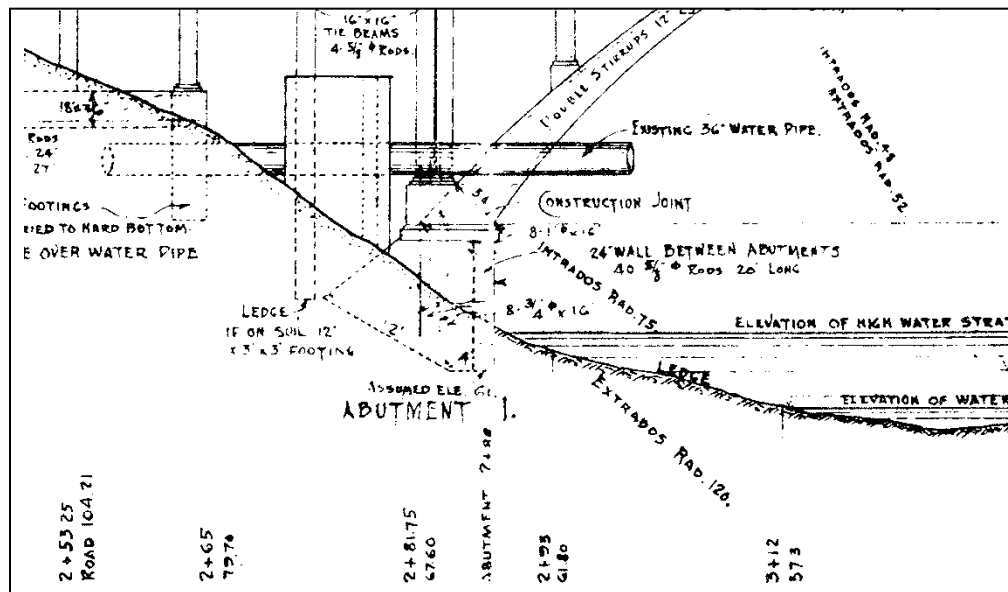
Part of a construction plan showing the Woronoco Bridge abutment-arch connection (courtesy of MassHighway).
